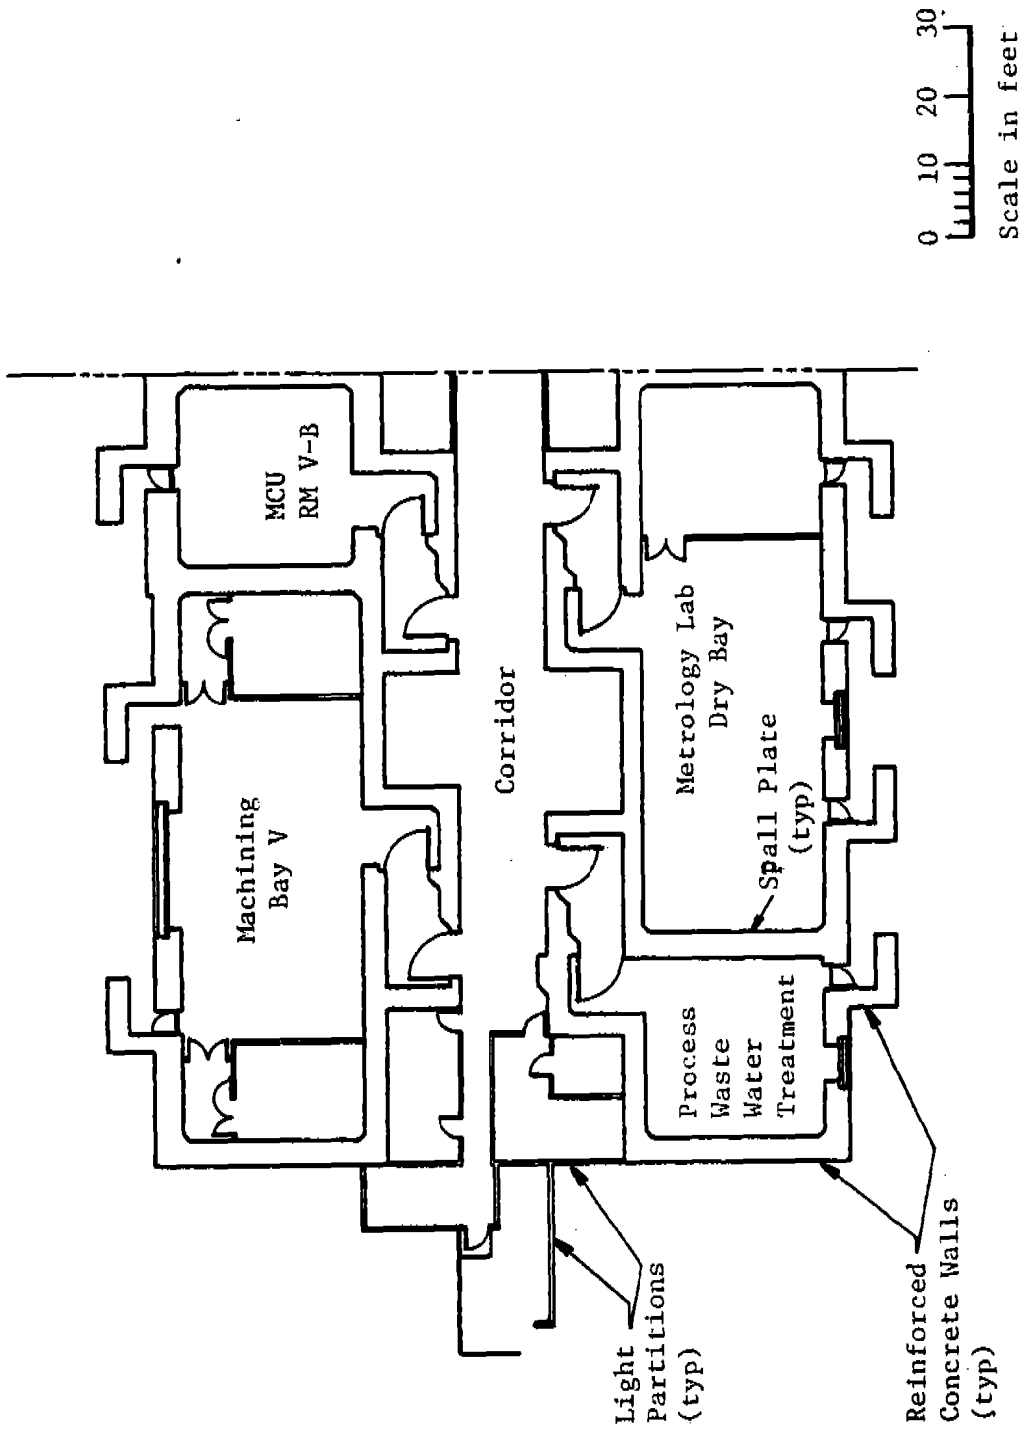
Plan View of West Sector for an Above-Ground Containment Building at Pantex (New HE Development Machining Facility)
